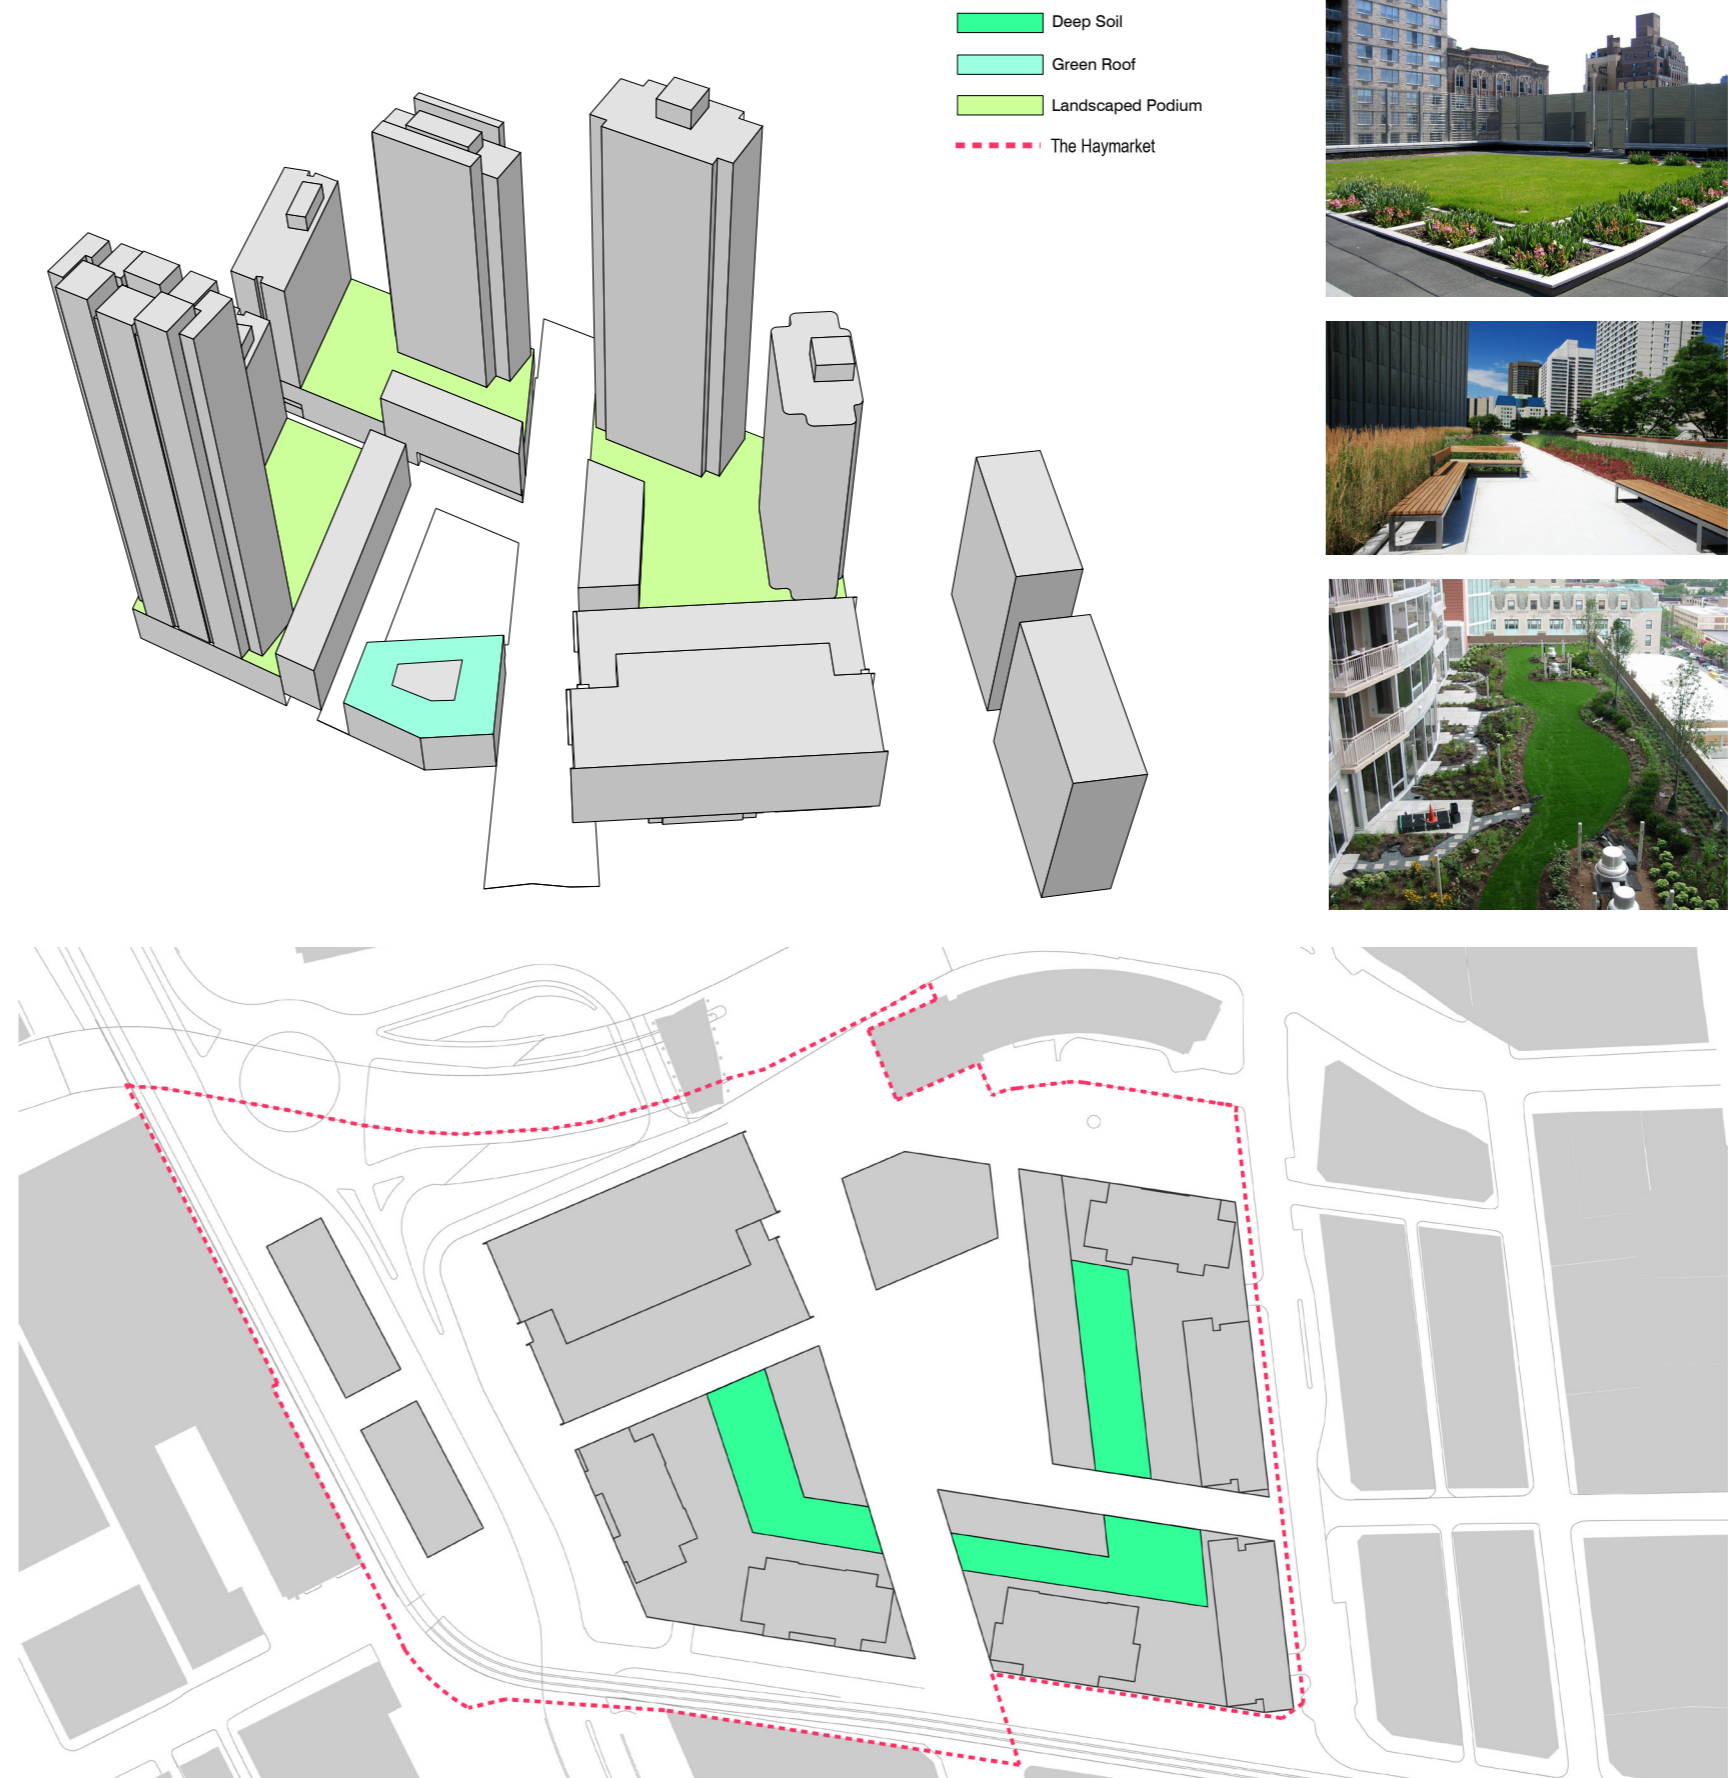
Illustrative podium roof diagram indicating landscape zones
